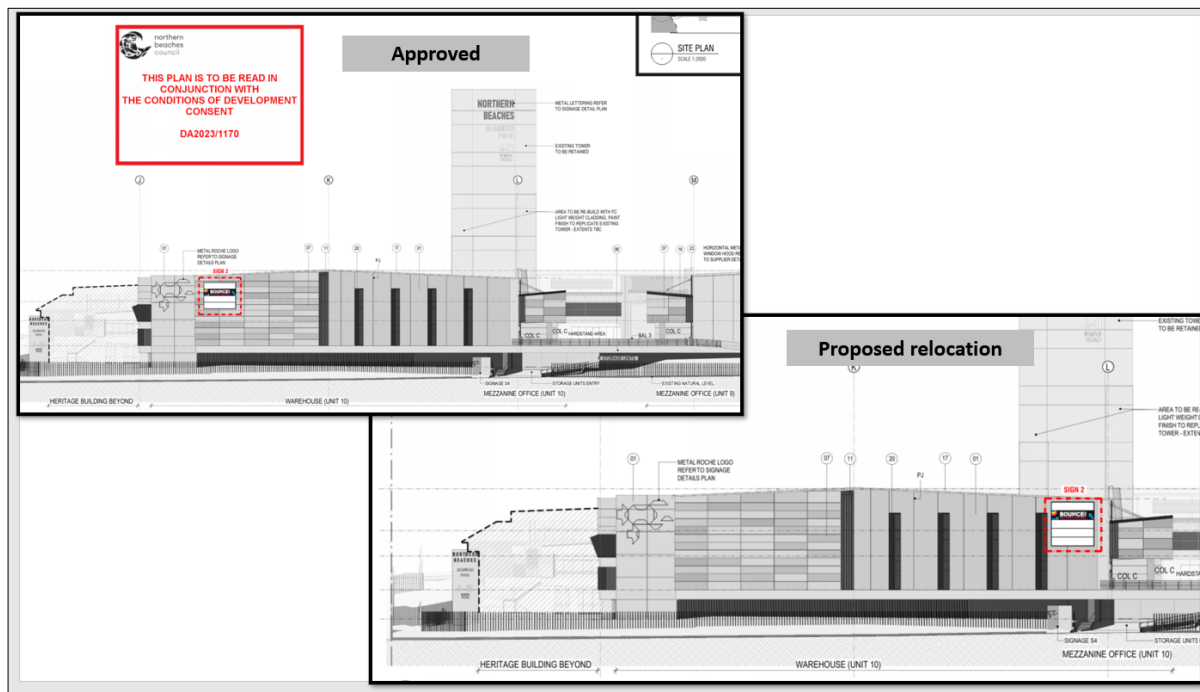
Proposed Modification (Source: 2M Creative, 2023)
